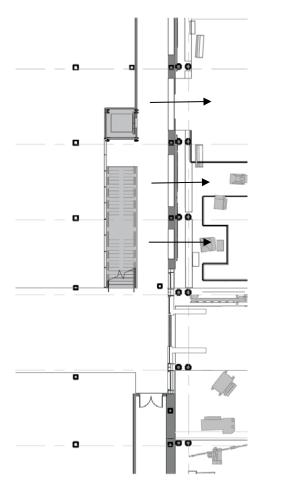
Proposed Bay 2 & 3 Wall - Ground Floor Source: Sissons
